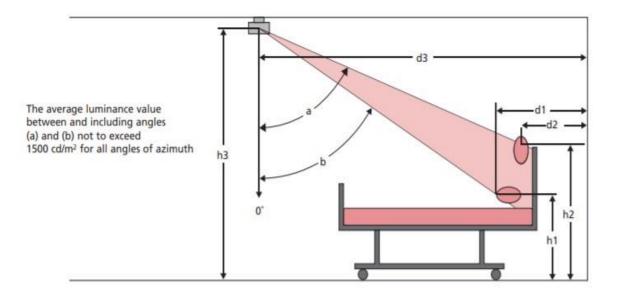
Elevation Angles for Ceiling Mounted Luminaires
